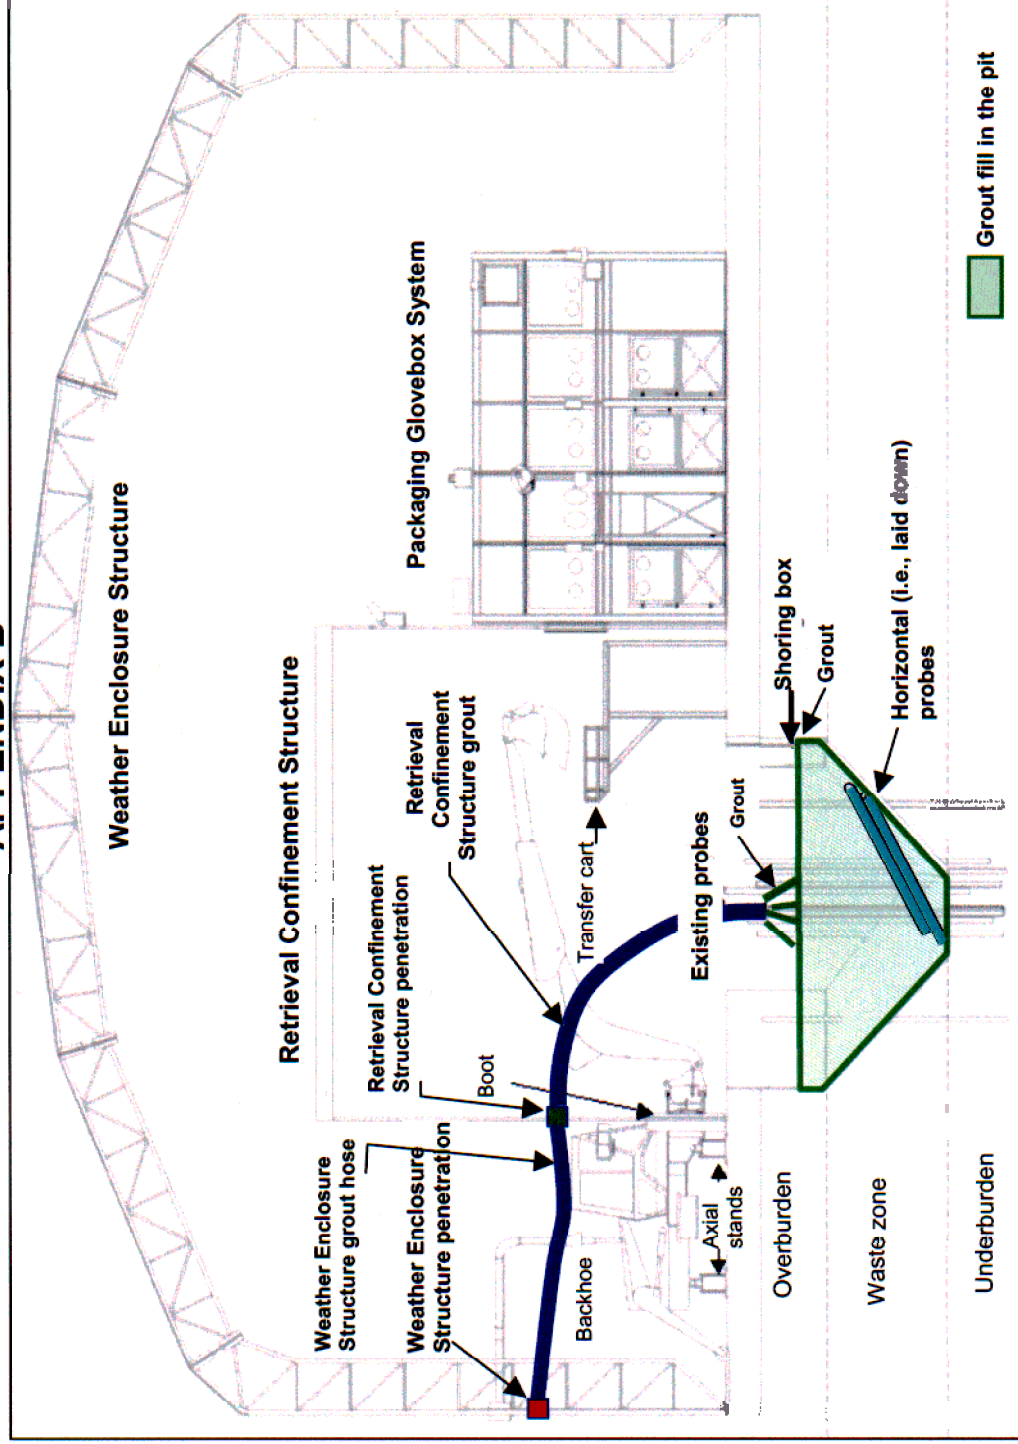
Drawing showing main parts of the OU 7-10 Glovebox Excavator Method Project equipment within the Weather Enclosure Structure.
